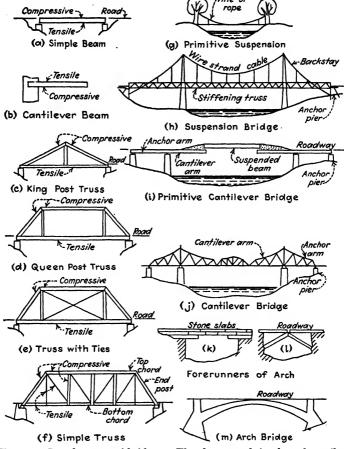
Development of bridges. The elements of simple and cantilever beams, and of suspension cables, have been extended to permit bridges to be placed across wide rivers.
